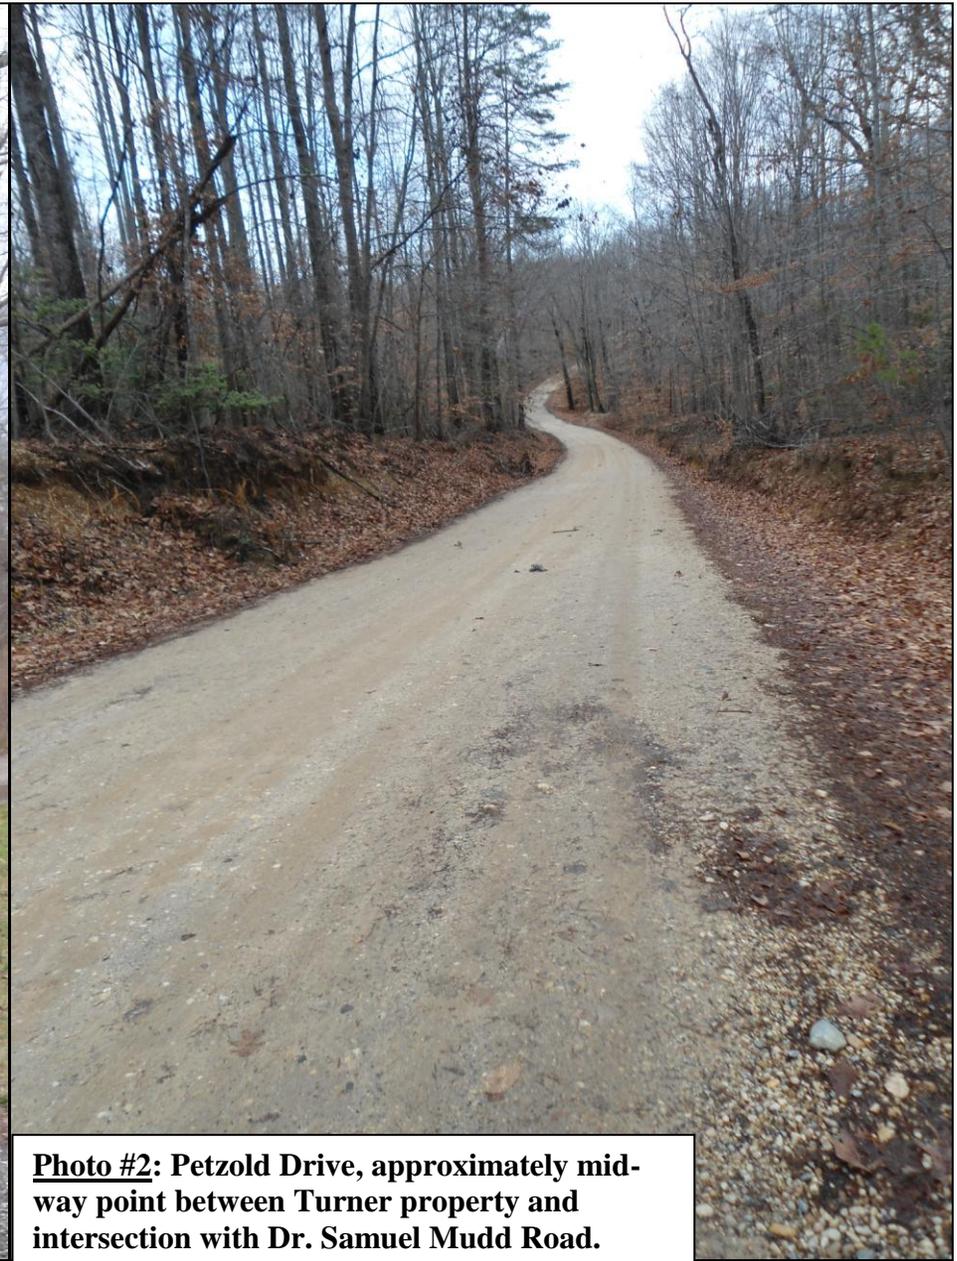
Petzold Drive, approximately mid-way point between Turner property and intersection with Dr. Samuel Mudd Road.
